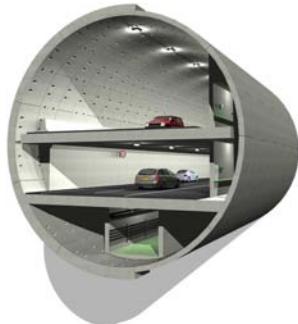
Cross section of a traffic tunnel: a case for HPFRC?
